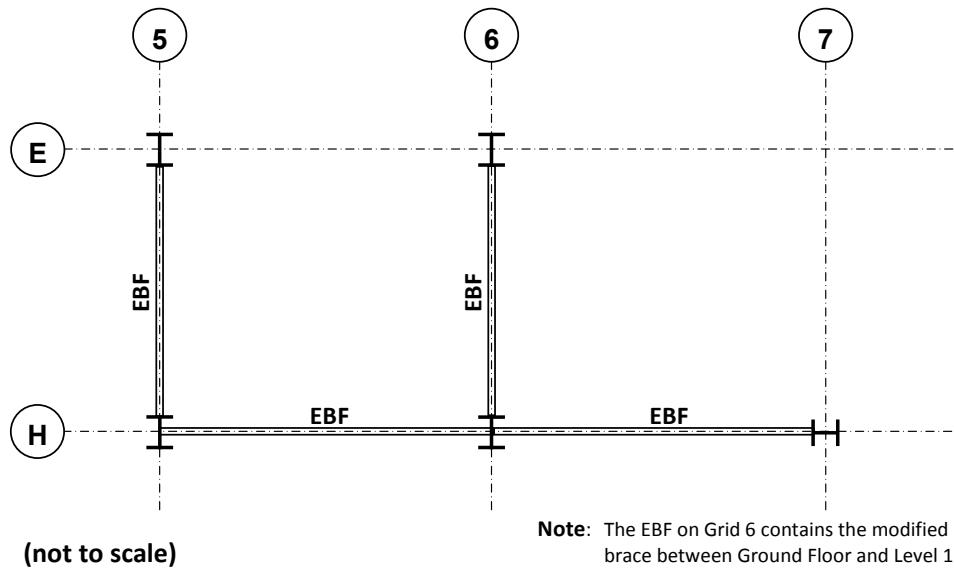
Part floor plan showing EBFs on Grids 5, 6 and H
